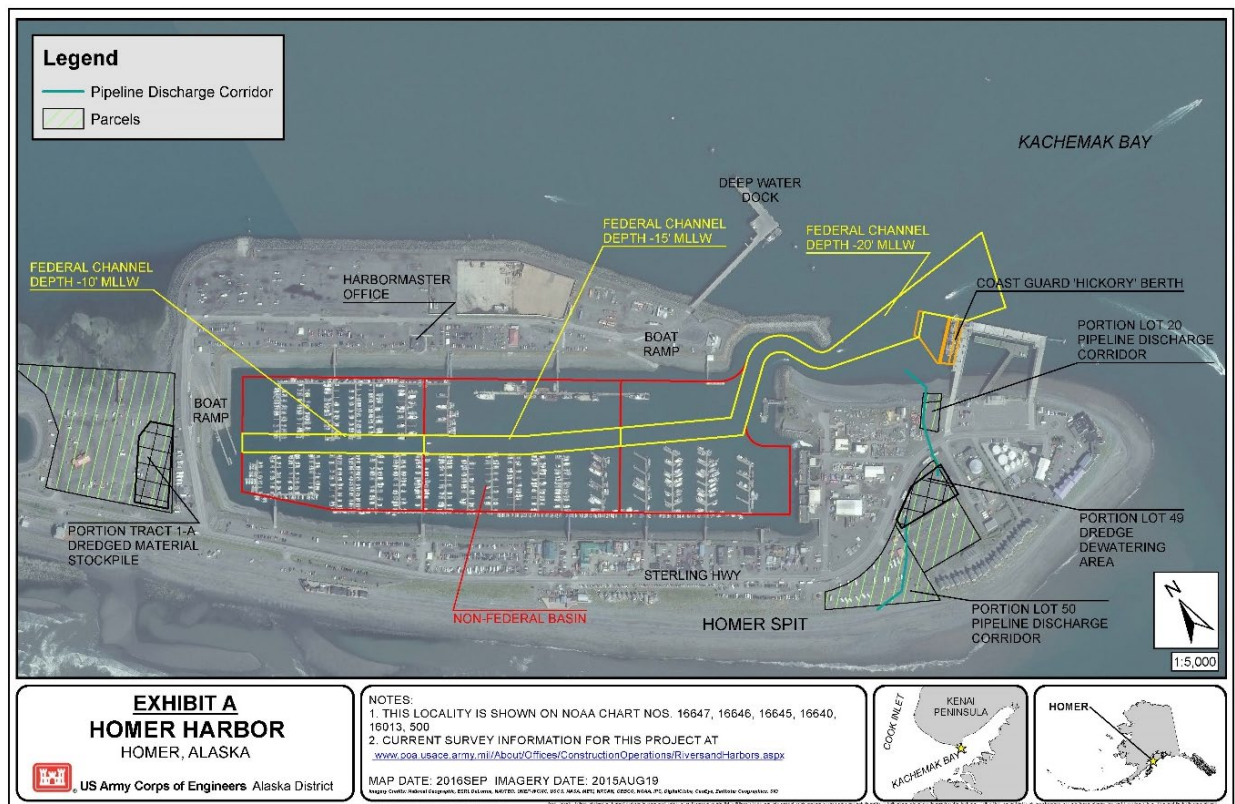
Location and layout of dredging, dewatering, and stockpile areas at Homer SBH (from USACE 2017a)
